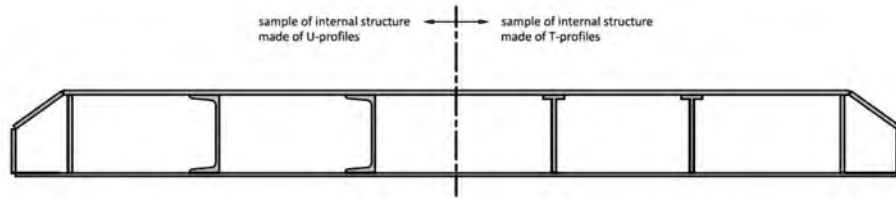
Typical fender panel cross section samples (U profile on left, T-profiles on right side)
